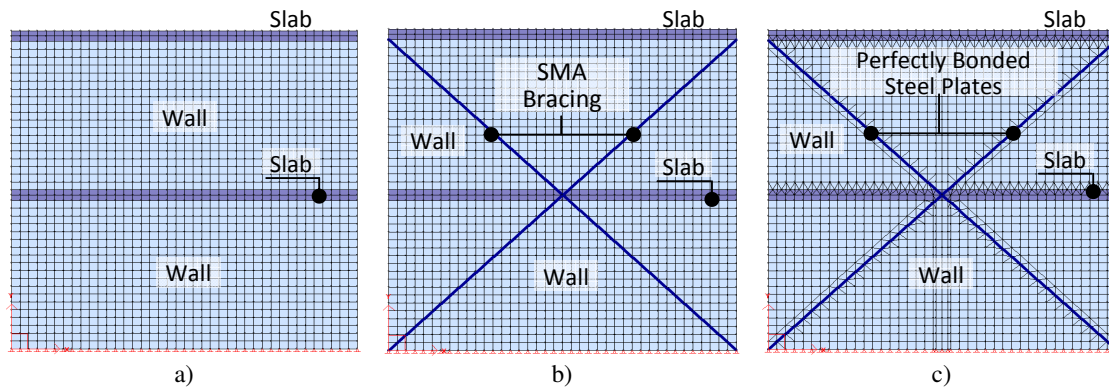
Finite element models for shear walls: a) Original; b) SMA retrofitted; c) Steel plate retrofitted
